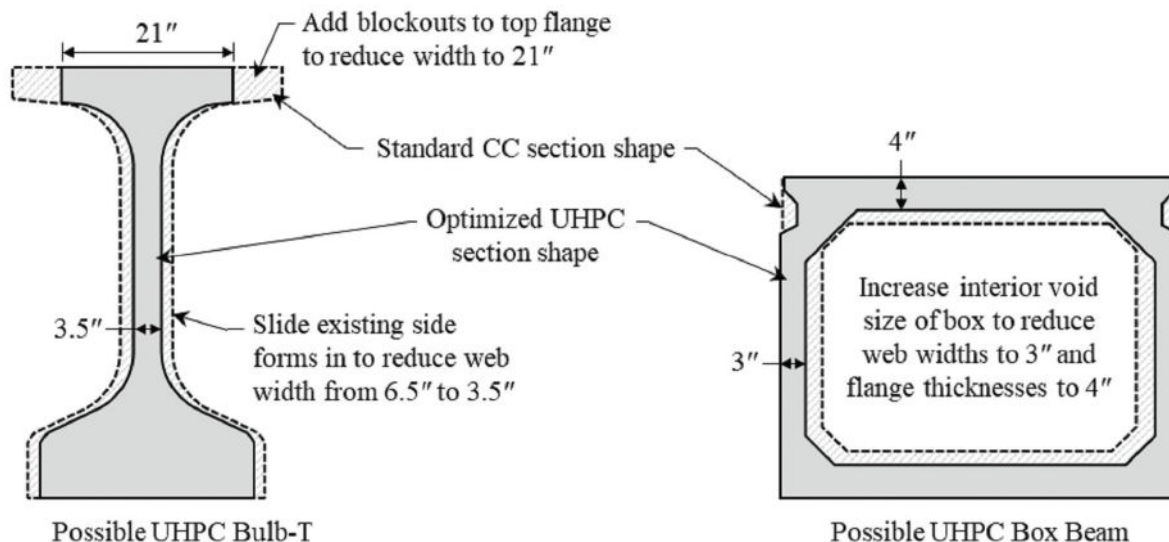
Ultra-high-performance concrete (UHPC) section shapes are optimized by modifying the existing formwork for conventional concrete (CC) standardized shapes.
